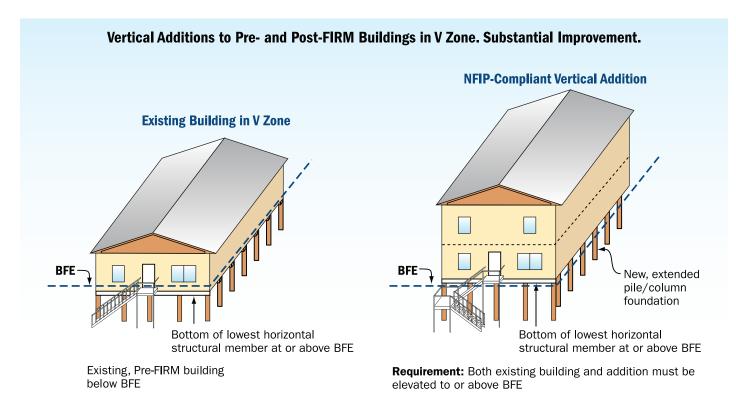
Substantial improvement: Vertical addition to a pre-FIRM building in a V zone.
